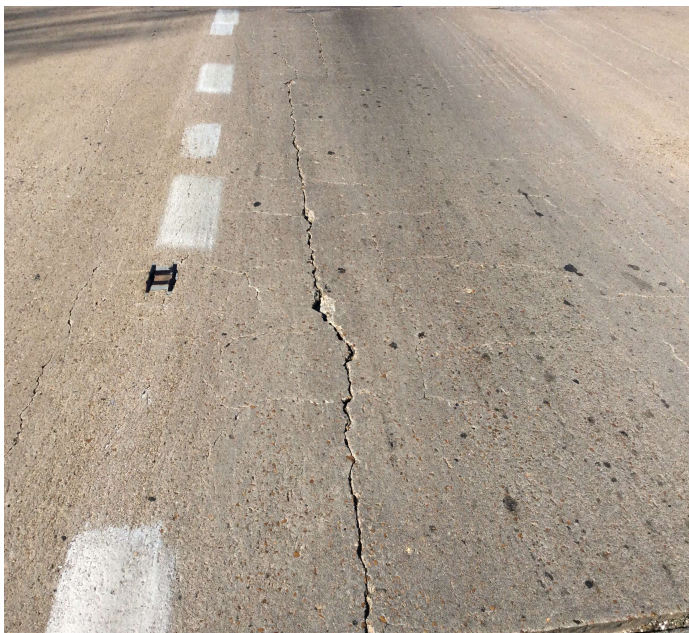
Description Typ. Long Cracking in Deck.
